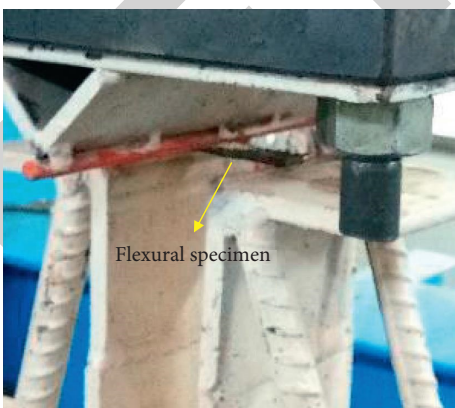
Three-point loading for testing of BFRP flexure specimens.
